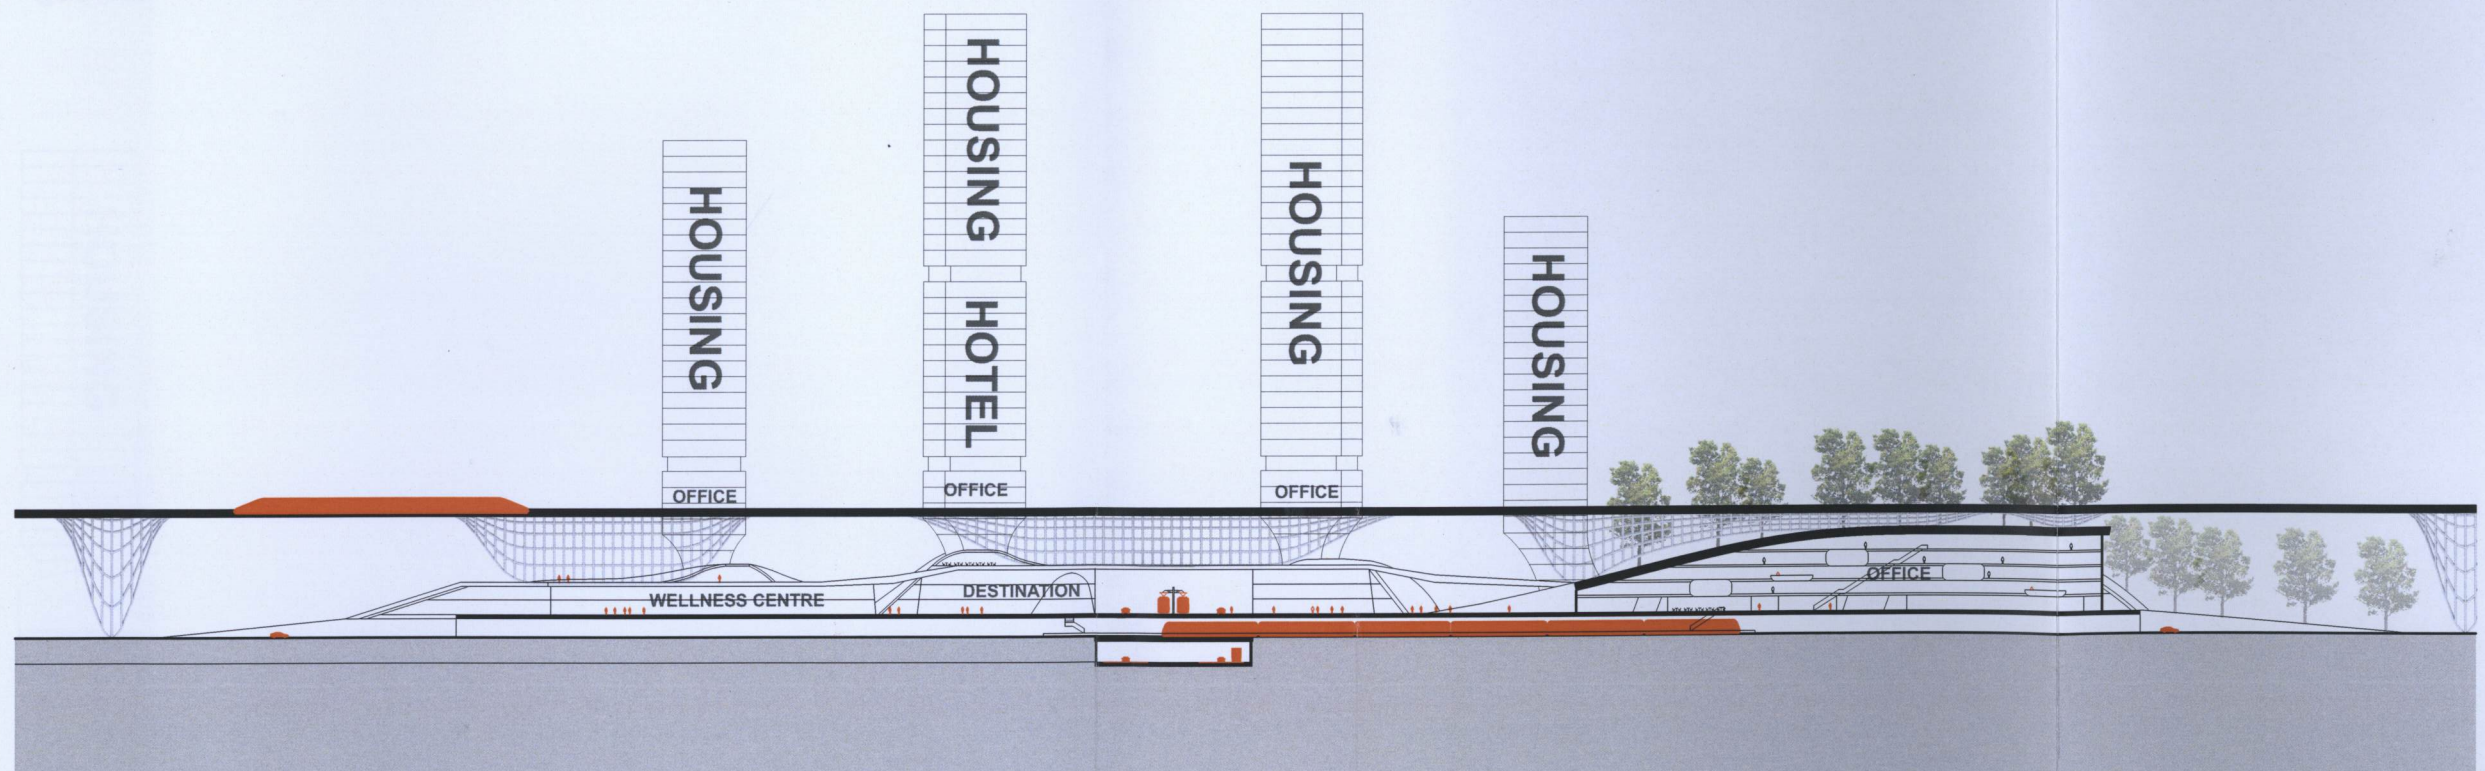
Section B (fig. 6-25) cut through the central amenity space looking east
